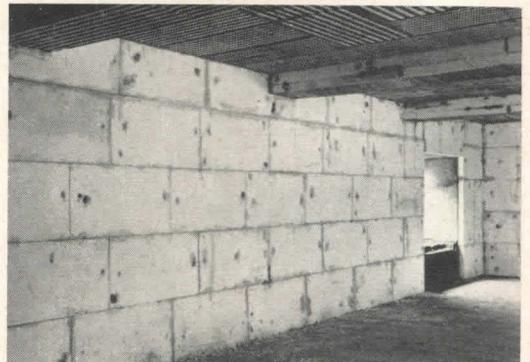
To insulate a double brick wall, the insulating foam layer is placed against one masonry wall before laying up the second
